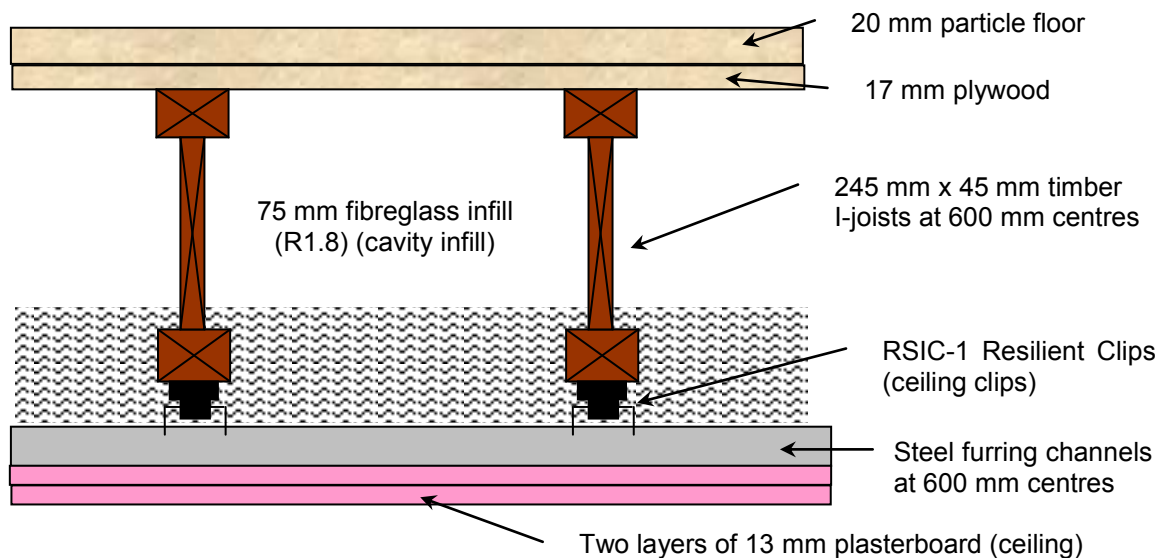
20 mm particleboard screw-fixed to plywood flooring
